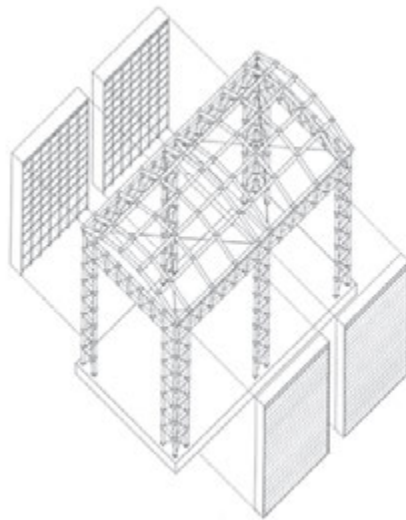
Exploded axonometric view of the structure of Library of a Poet, 1991
